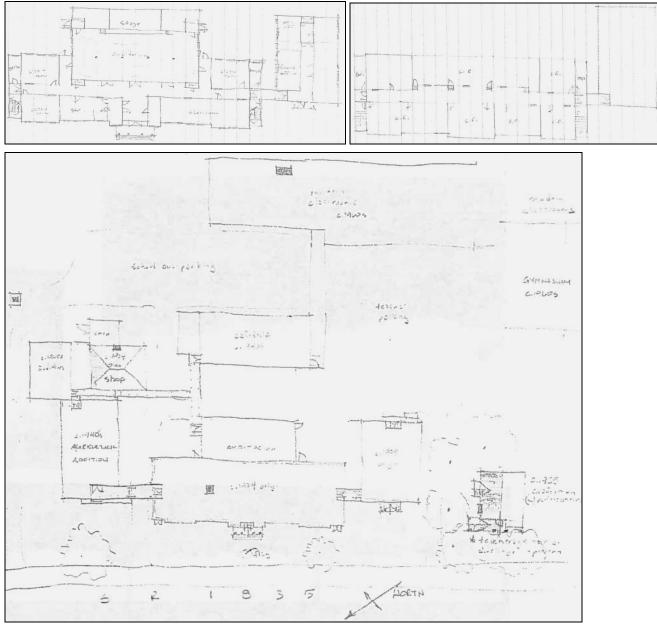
School: first-floor plan at top left and second-floor plan at top right; Site plan at bottom: original main block of school at bottom center and teacherage at bottom right (source: Robbie Jones field notes, 1993)
